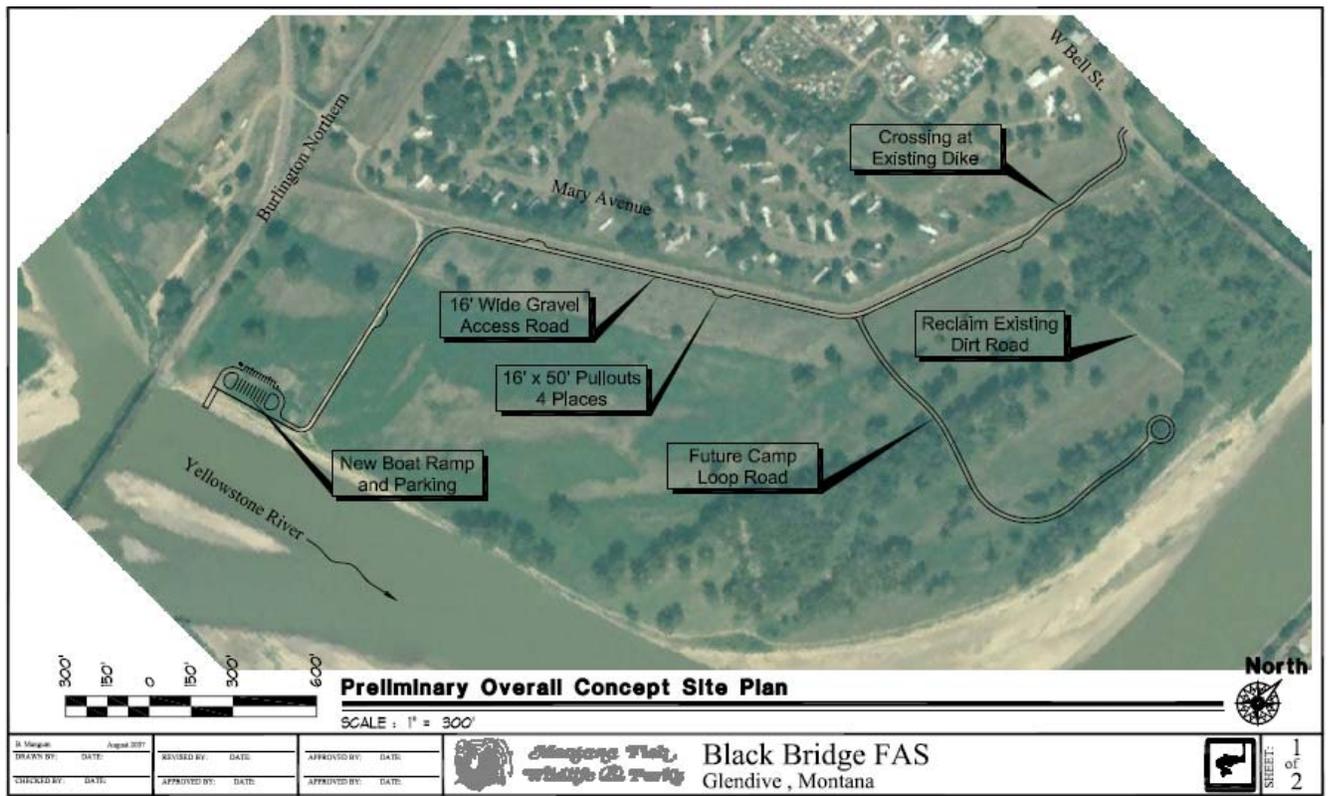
Preliminary overall site plan of proposed development at Black Bridge FAS.
